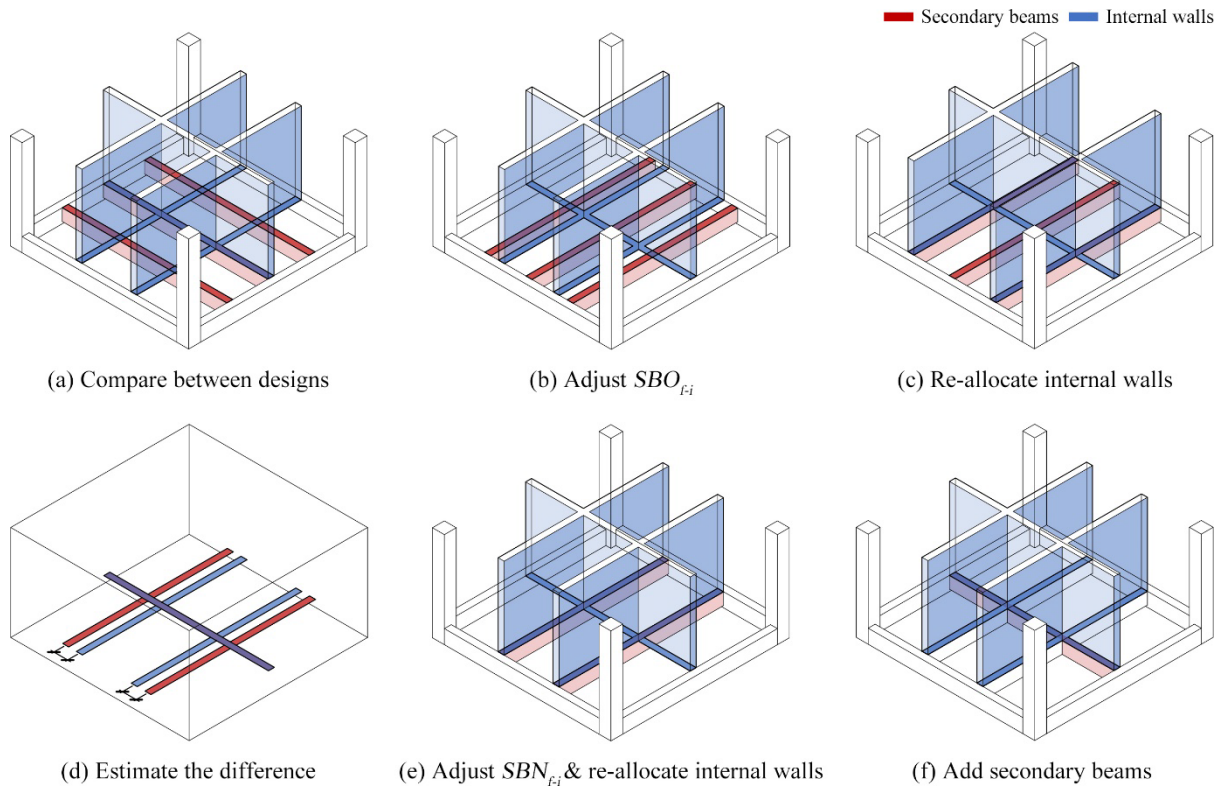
The process of re-allocating internal walls and secondary beams.
